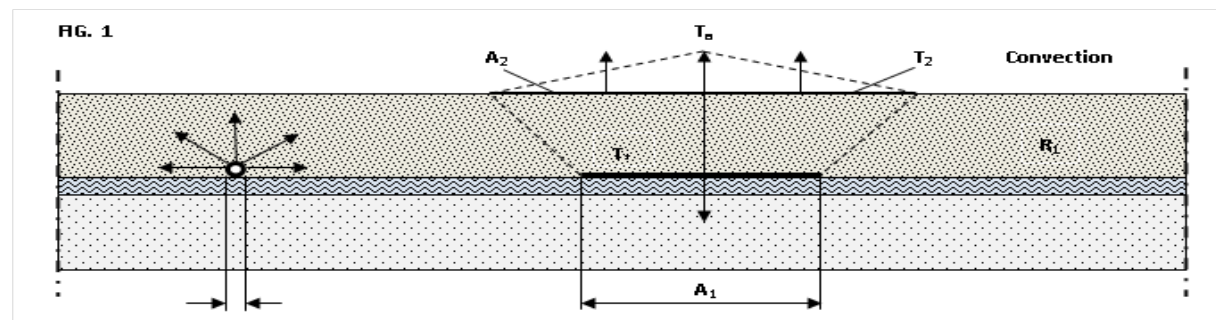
shows a cross sectional area of a floor with a cable or tubing and STEP Warmfloor® flat element.
